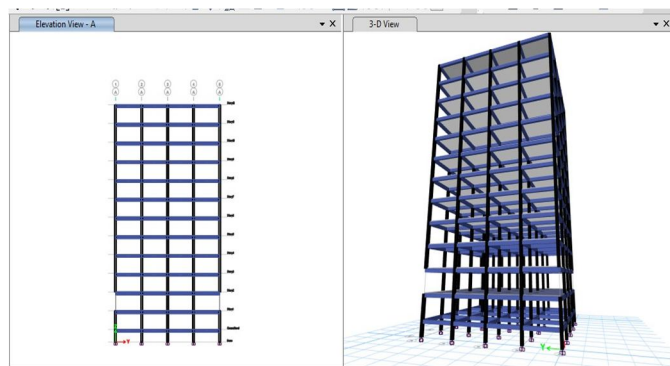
Model B- Building frame with Floating Column @ 1st Floor at 4 external corners
